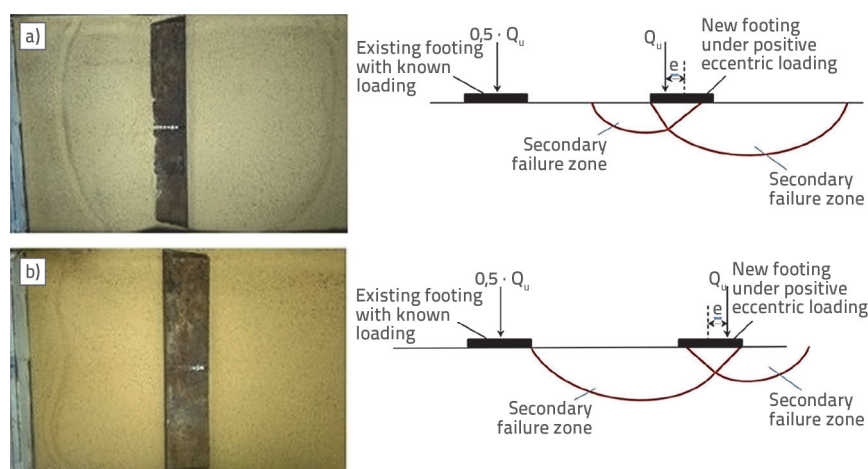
Failure mechanism of the soil beneath a strip footing under eccentric loading for a relative spacing of $x/B = 3$: a) Mechanism Type B+ ($e/B = +0.1$); b) Mechanism Type B- ($e/B = -0.1$)
